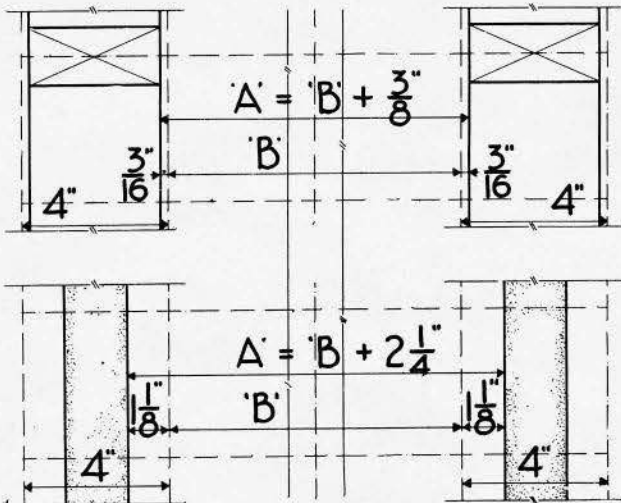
Examples of difference between grid and actual dimensions; in this case, centre-line dimensioning could be recommended.
